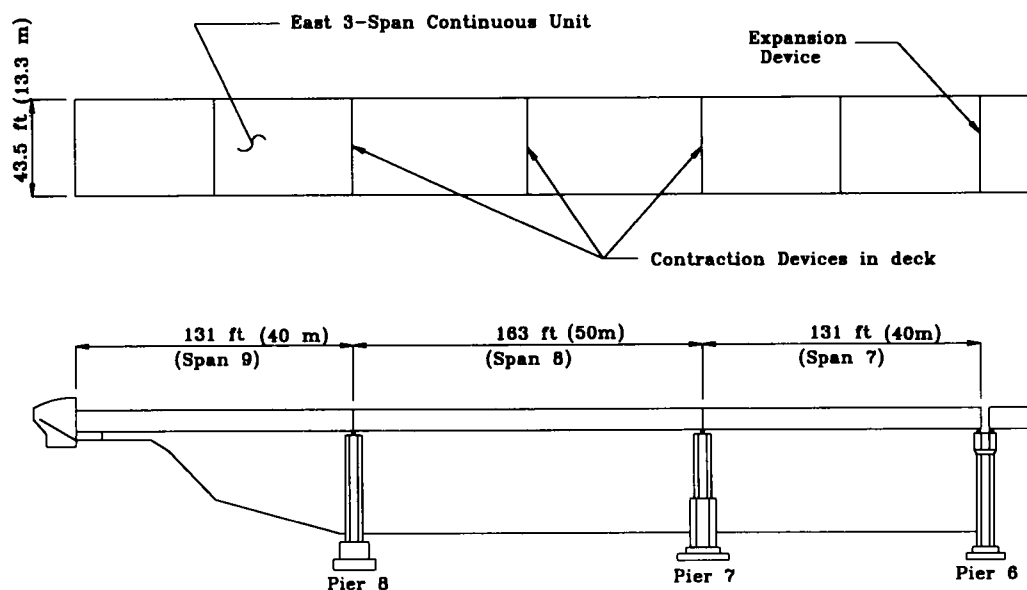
Overall plan and elevation of east three-span continuous unit of eastbound I-40 bridge.
